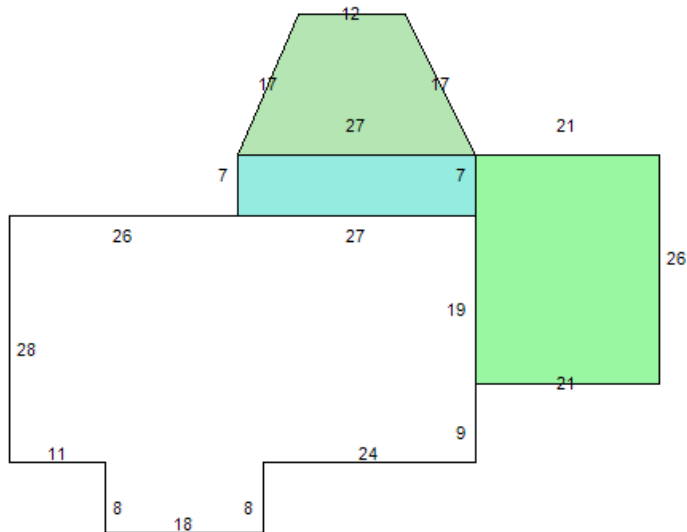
SJ07785 Base Area Plan (St. Johns County Property Appraiser)
